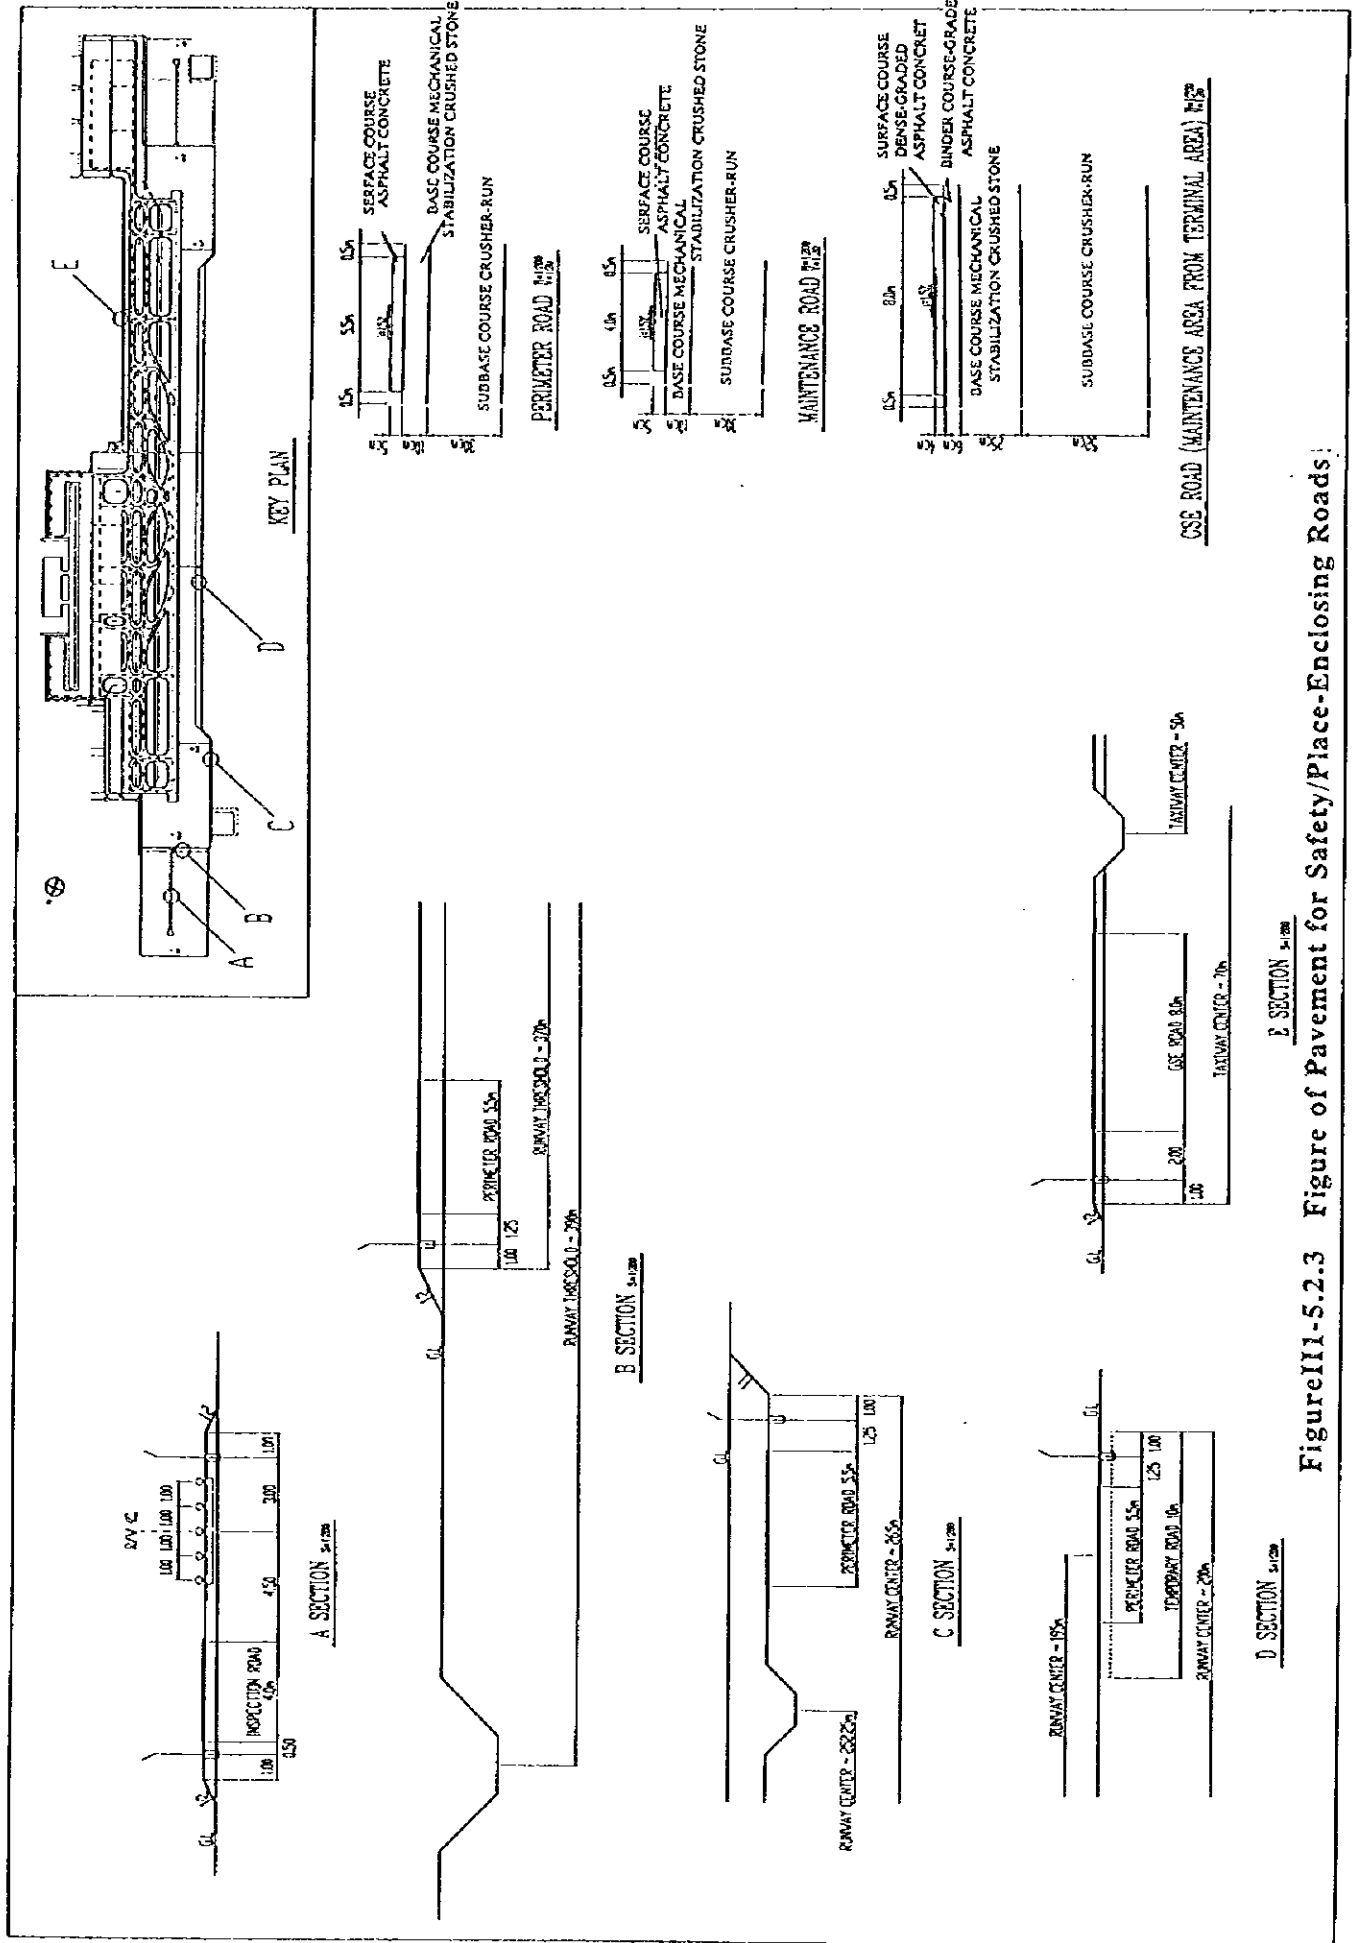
Figure of Pavement for Safety/Place-Enclosing Roads
